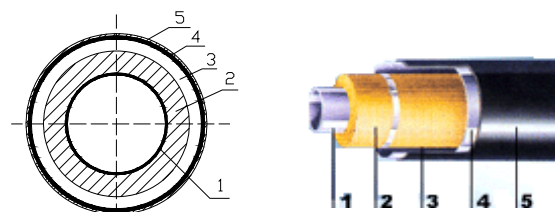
Schematic of the vacuum insulated heating pipeline with steel jacket
